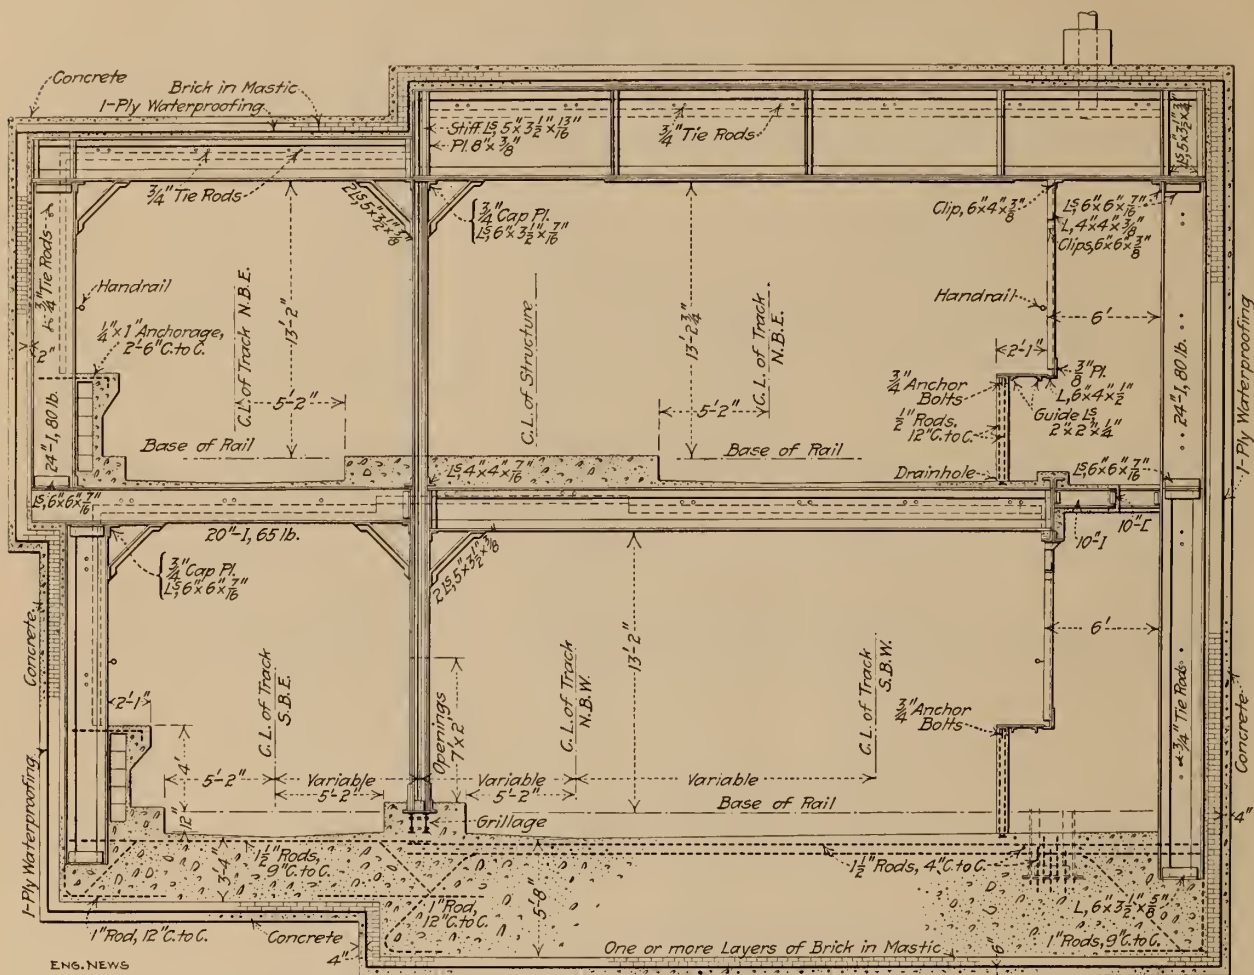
LEXINGTON AVE. SUBWAY AT 129TH ST. DOUBLE-DECK STEEL-FRAME CONSTRUCTION WITH HEAVY REINFORCED-CONCRETE FLOOR
